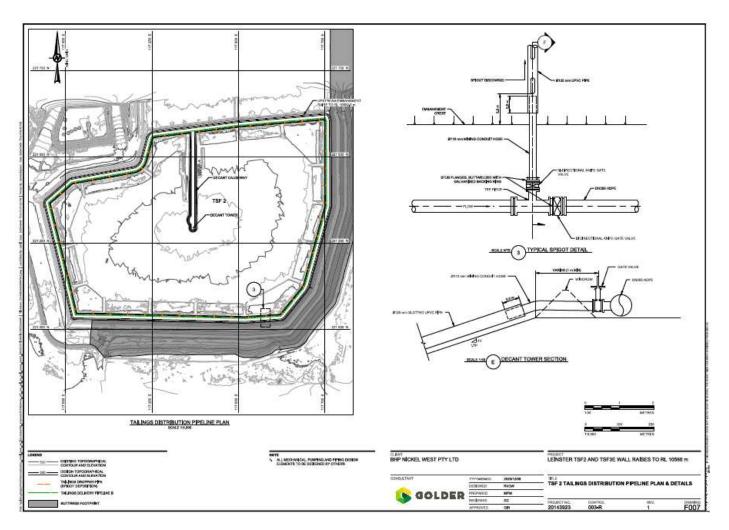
TSF2 Tailings Distribution pipeline plan and spigot design
